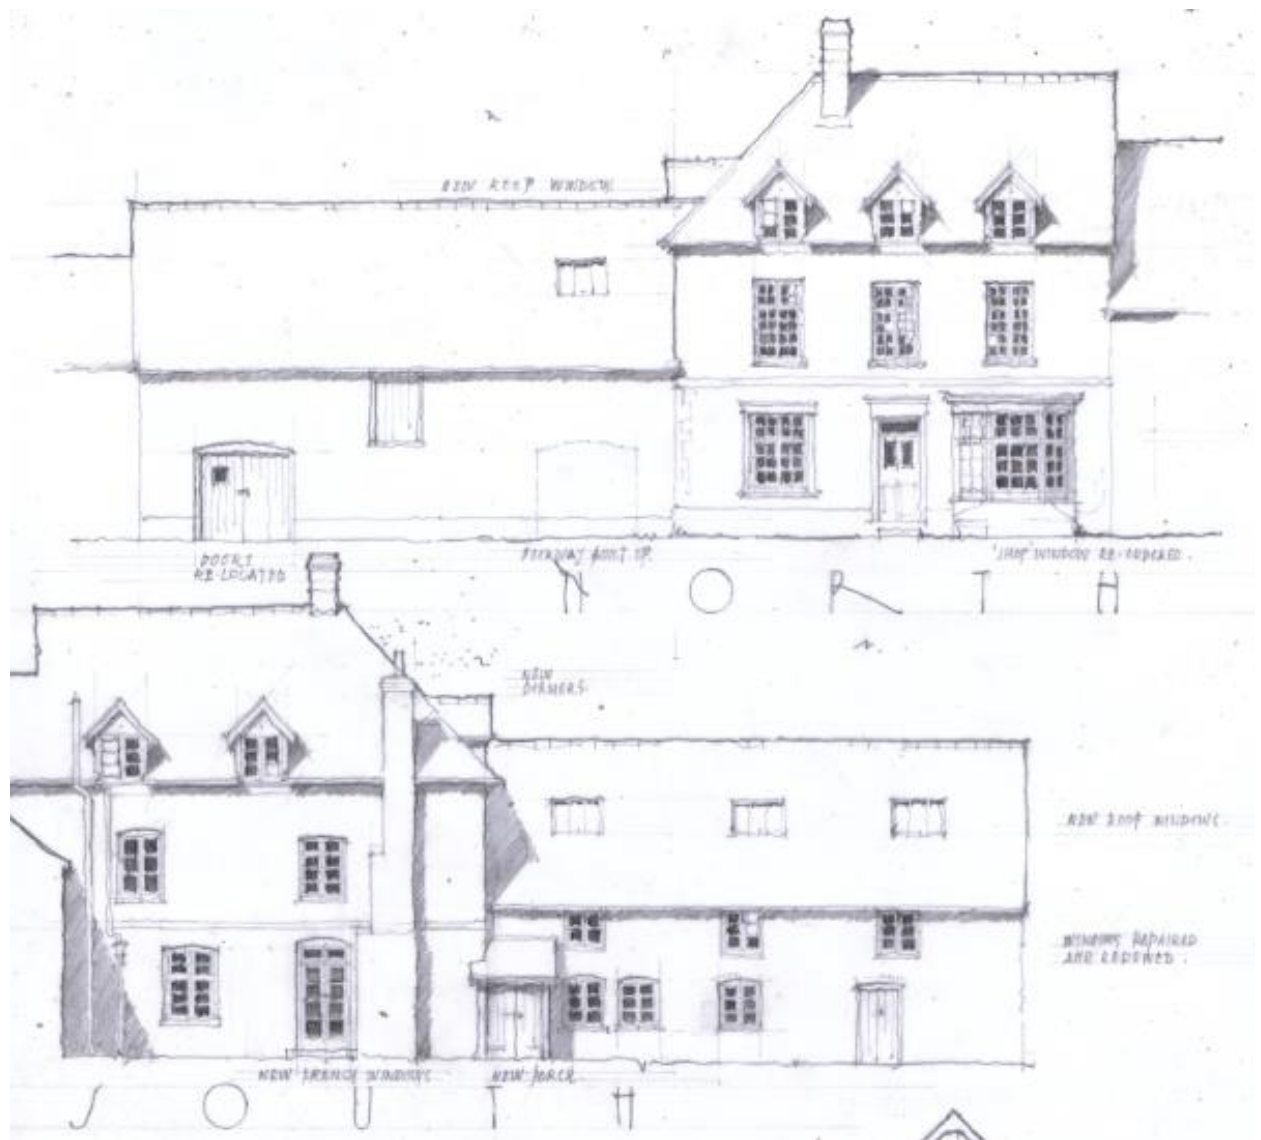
North and South Elevation Plans approved pursuant to P184664/F and P184665/L
